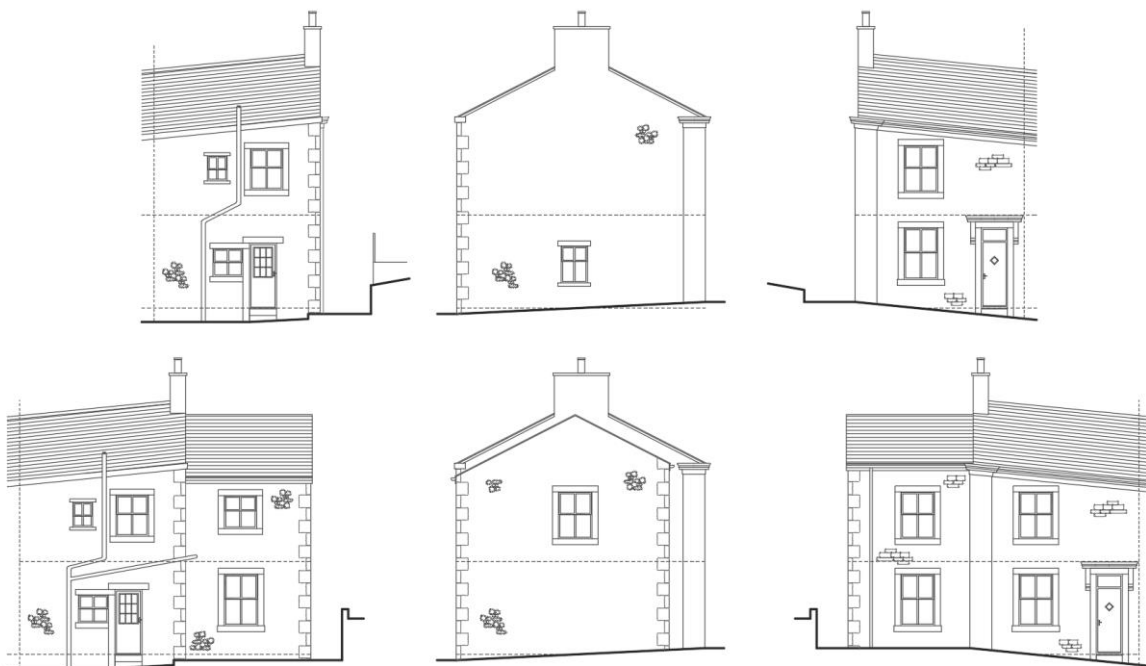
EXISTING AND PROPOSED ELEVATIONS
